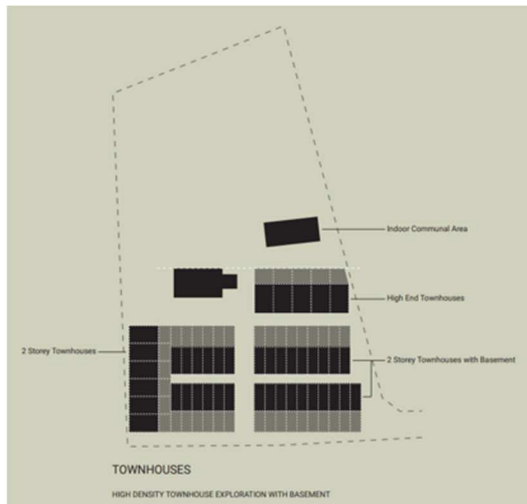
'High density townhouse exploration with basement'. Source: Plus Architecture, 2024.
